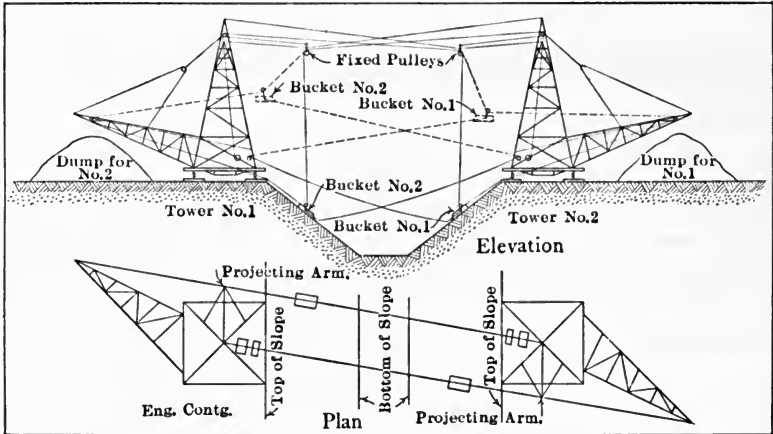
Diagram of double tower excavator. (Courtesy of Engineering and Contracting.)
